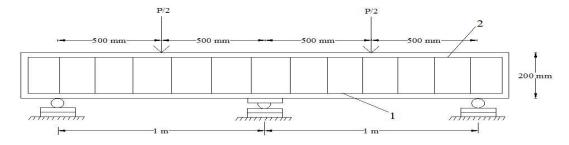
Detailing of reinforcement 1, 2 – top and bottom steel reinforcement
